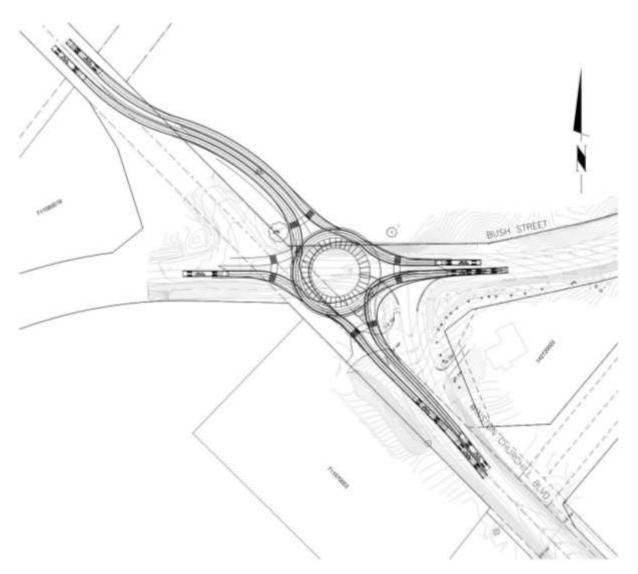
Bush Street / Winston Churchill Boulevard Roundabout Concept #3
